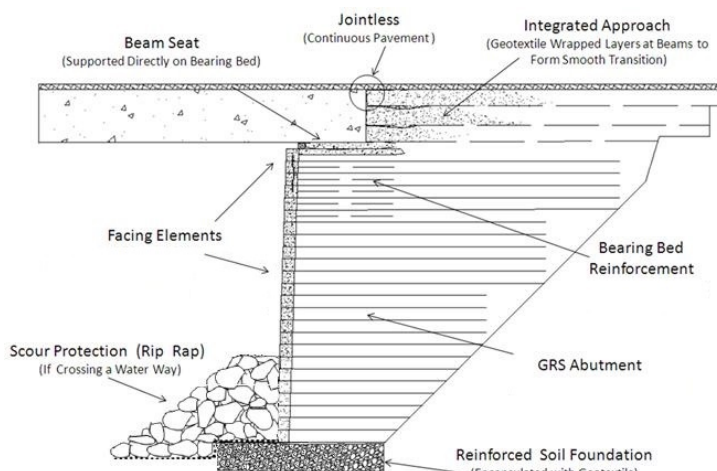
Geotextile reinforced soil integrated bridge system cross section showing typical characteristics (Used with the permission of FHWA)
